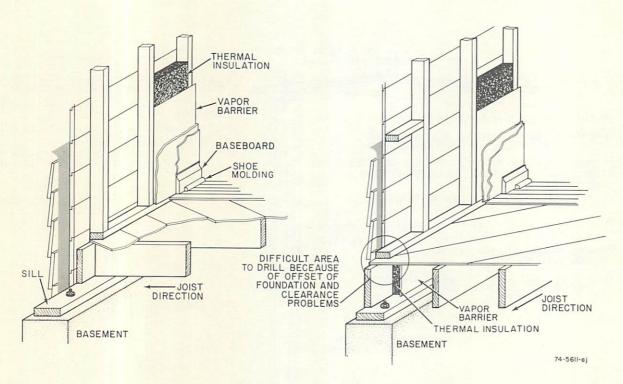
Access to Bottom of Outside Walls - Frame Buildings.
